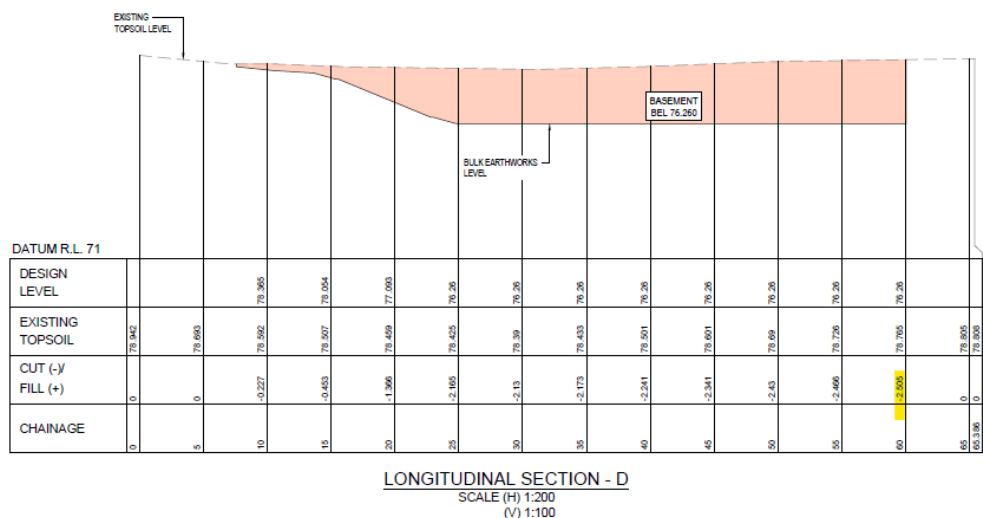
Section D showing maximum cut on the northern side of the proposed development.
